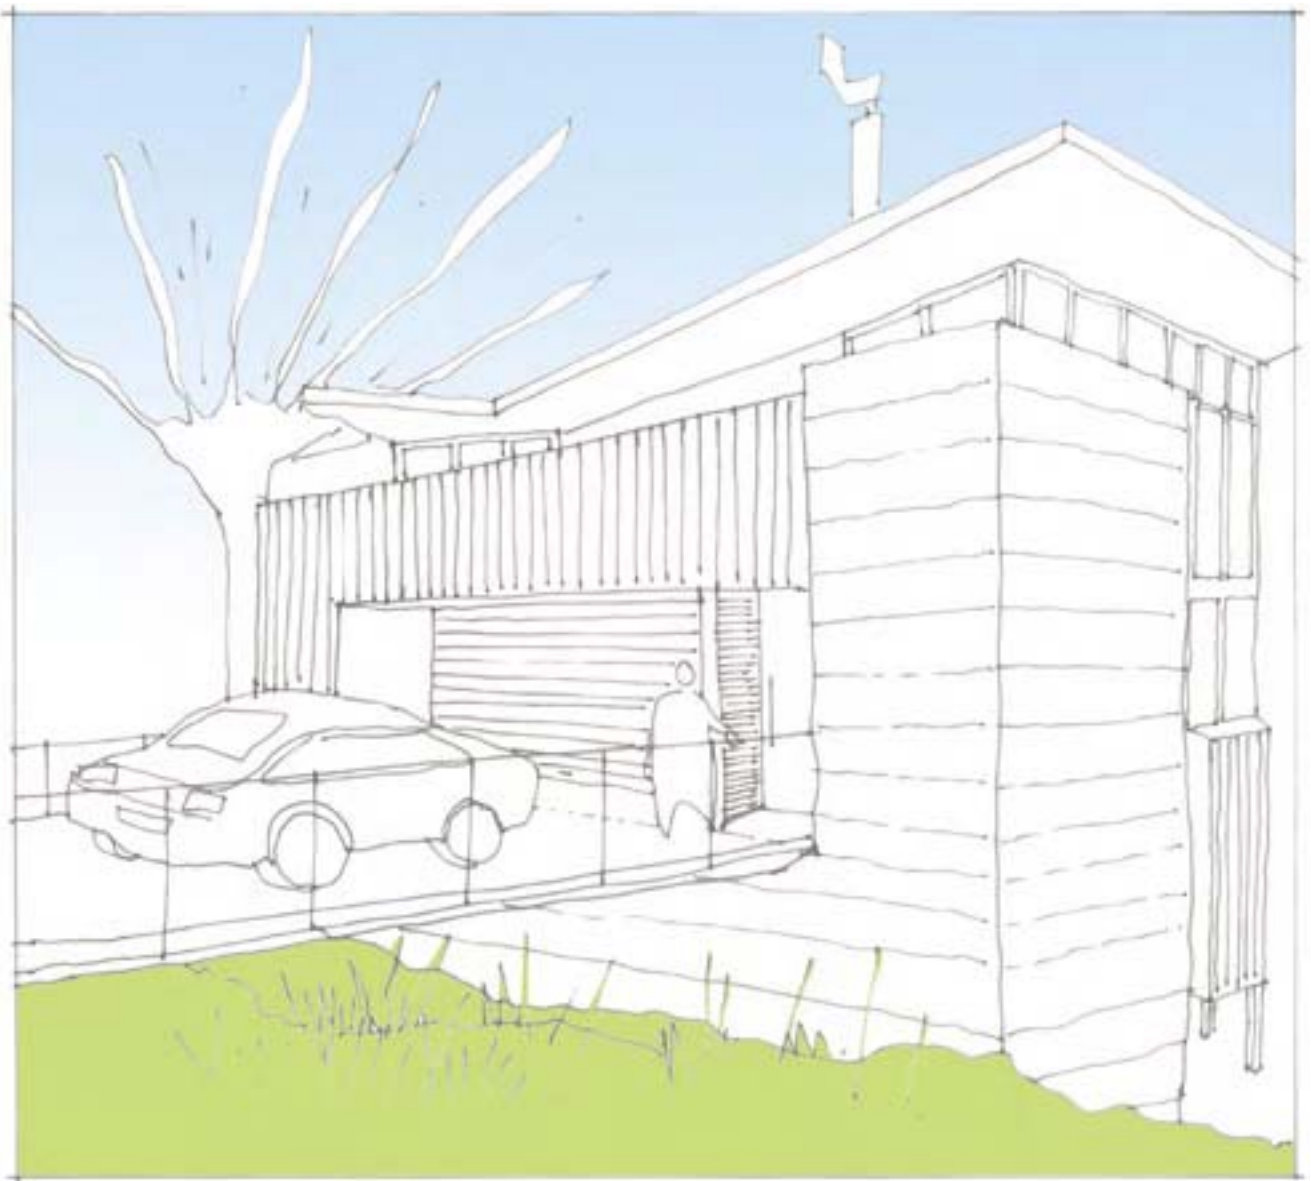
Driveway Guidelines — For steep sites, lightweight bridge structures may be used.
